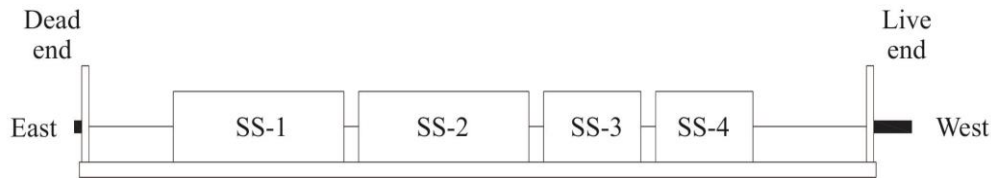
Specimen orientation on prestressing bed: SS precast beams (not to scale)
